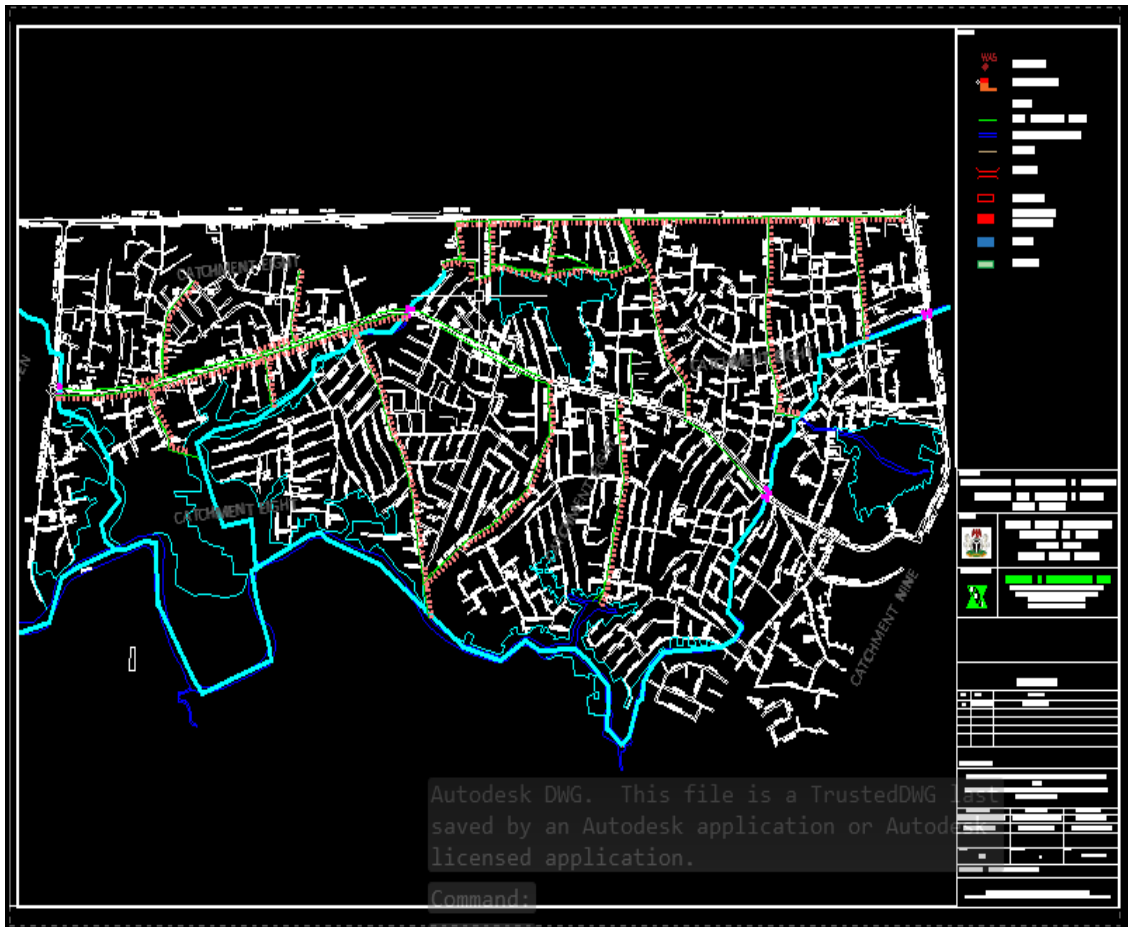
CATCHMENT 8 LAYOUT DRAWING
